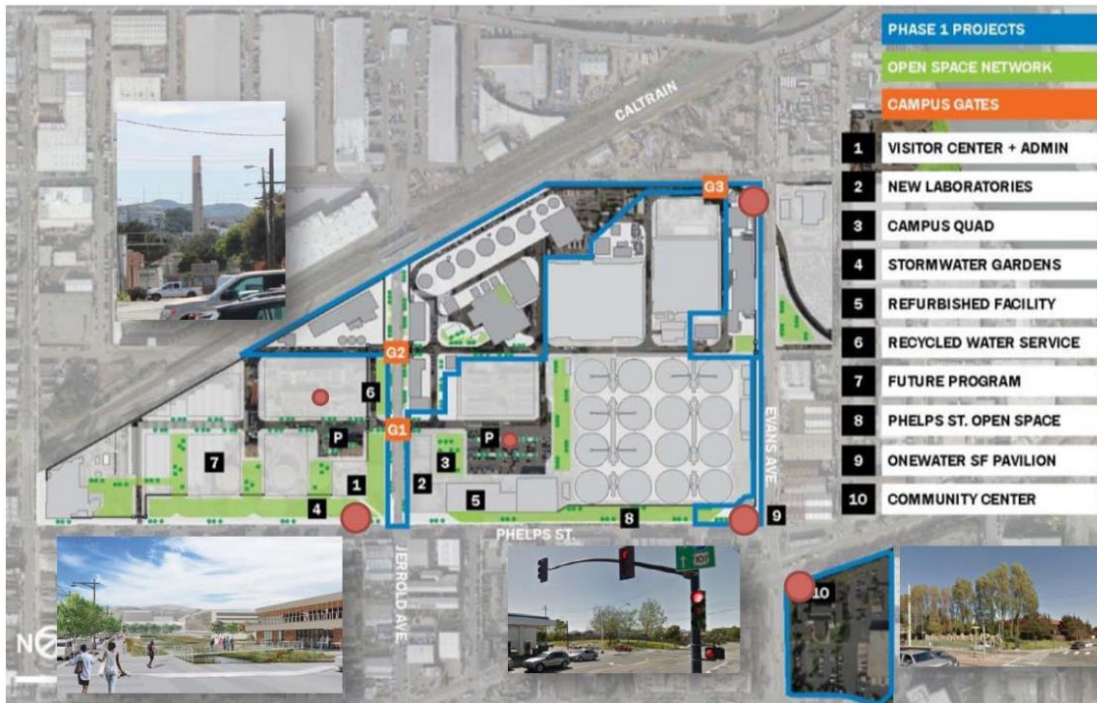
Potential locations of public art on the site of the new Southeast Treatment Plant.
